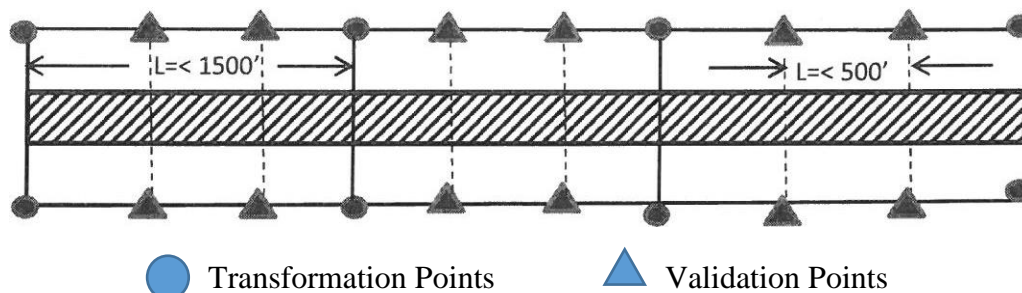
Typical MTLS Type A Local Transformation Layout
